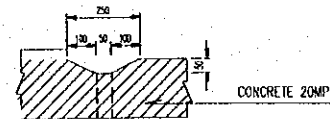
DETAIL OF ANCHOR OF ANGLE STEEL 80X50X5
